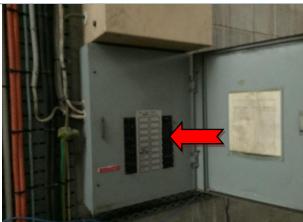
Interior: level 7, plant room, switchboard – suspected asbestos containing arc shields.
